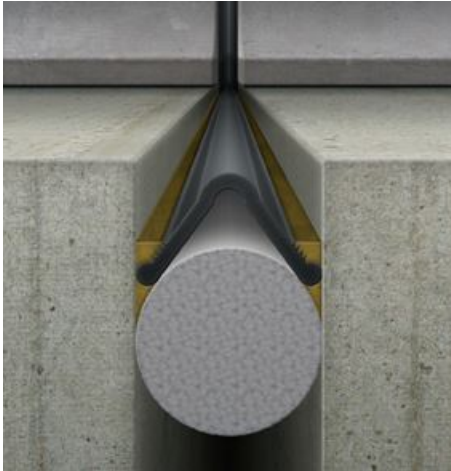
D.S. Brown V-Seal Expansion Joint System (D.S. Brown)
